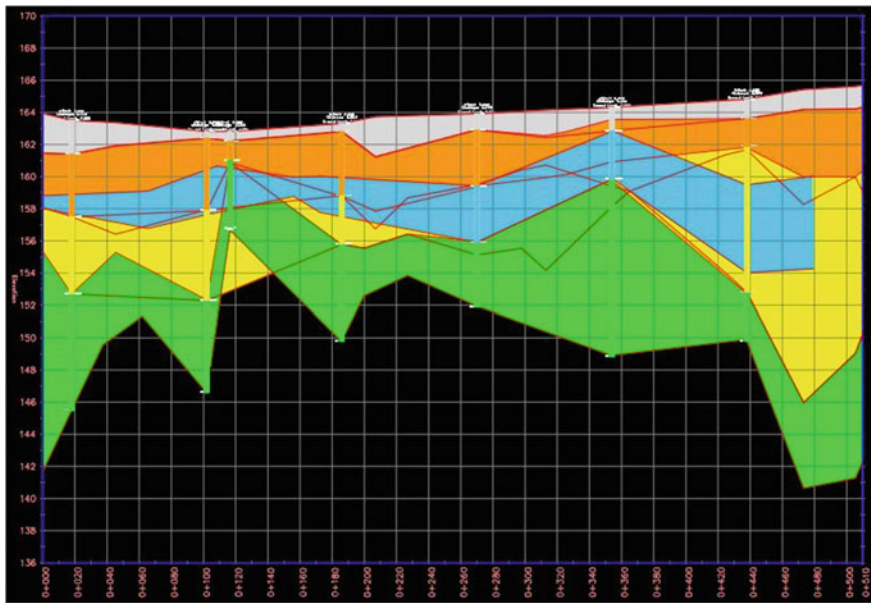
Section 1-1—Subsoil profile below main process plant foundation
